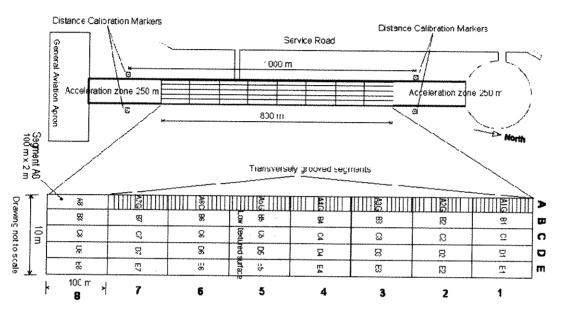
Layout of the Kollerud Test Track at Oslo Airport, Gardermoen.
